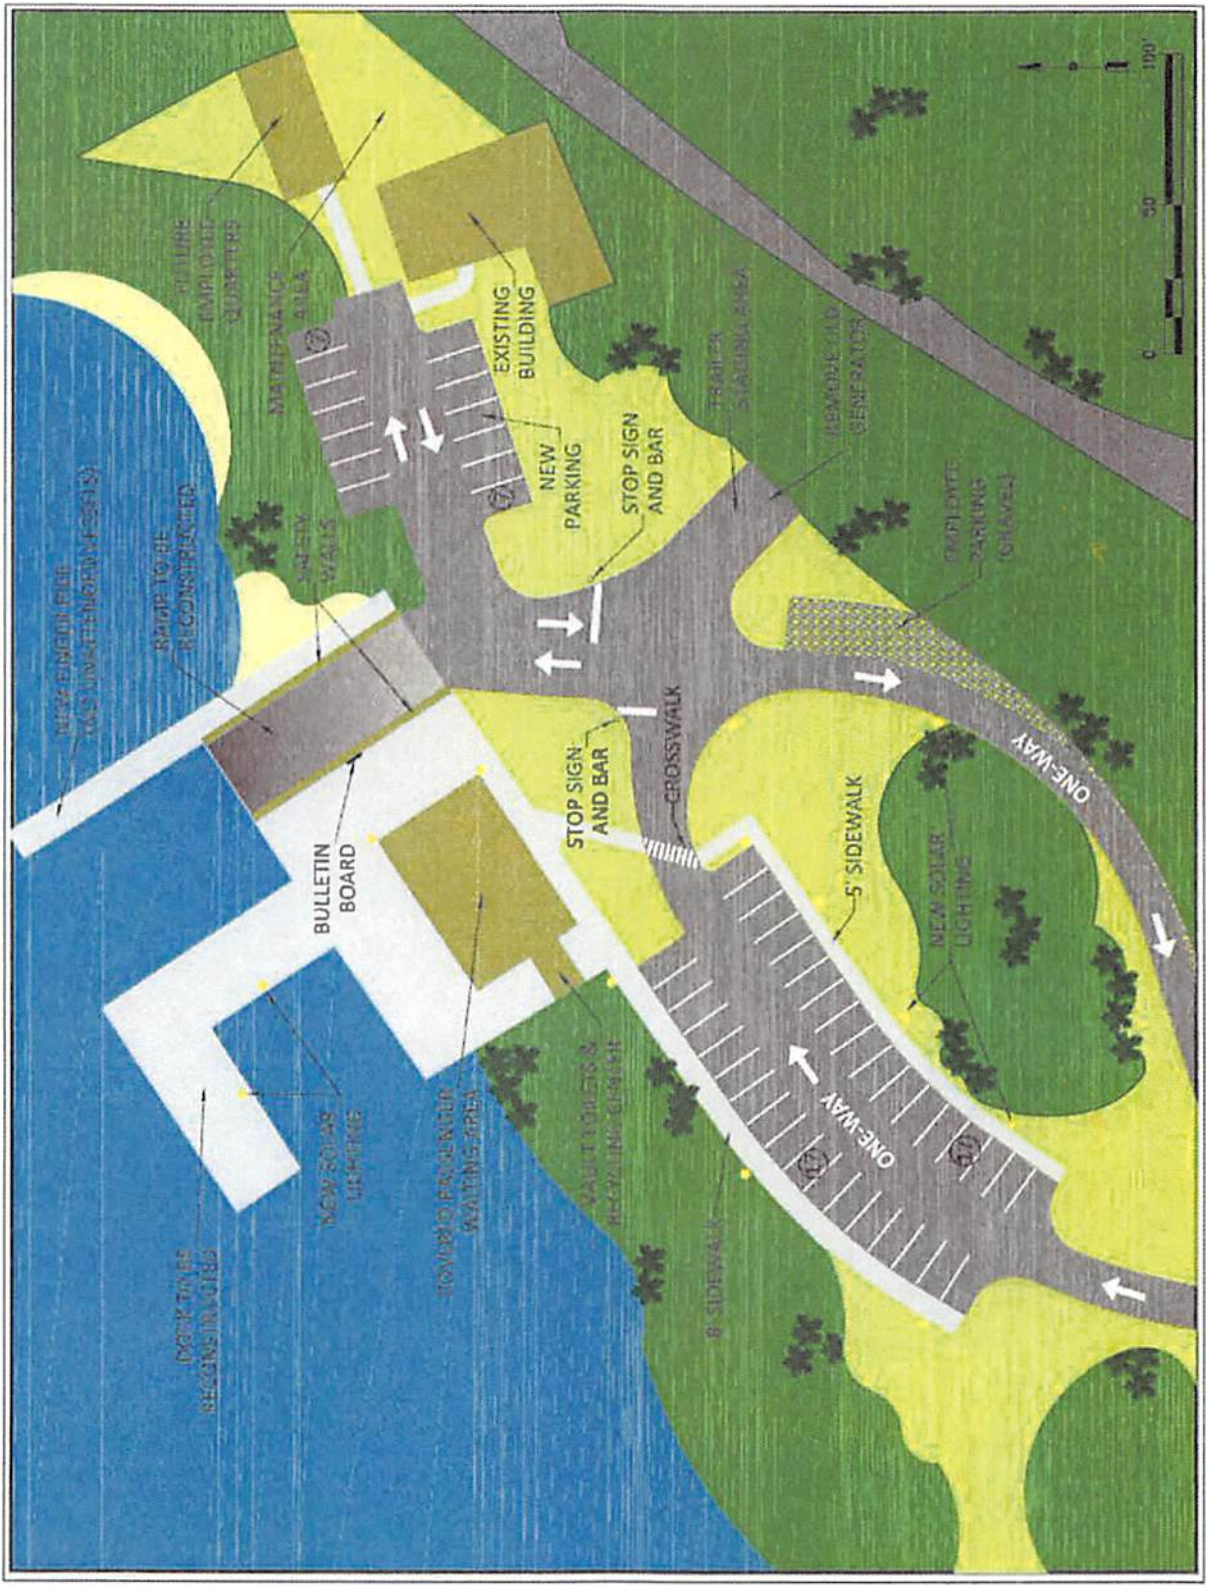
Conceptual Plan for Red Hook Intermodal Facility
